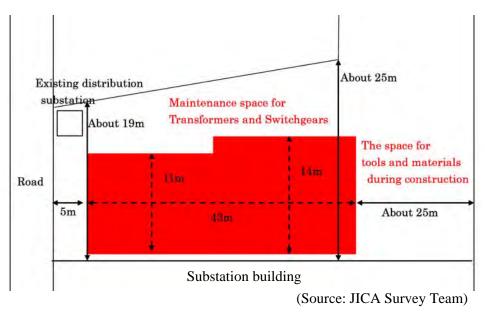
16 Allocation Image of Substation Building at EDC HQ Site
